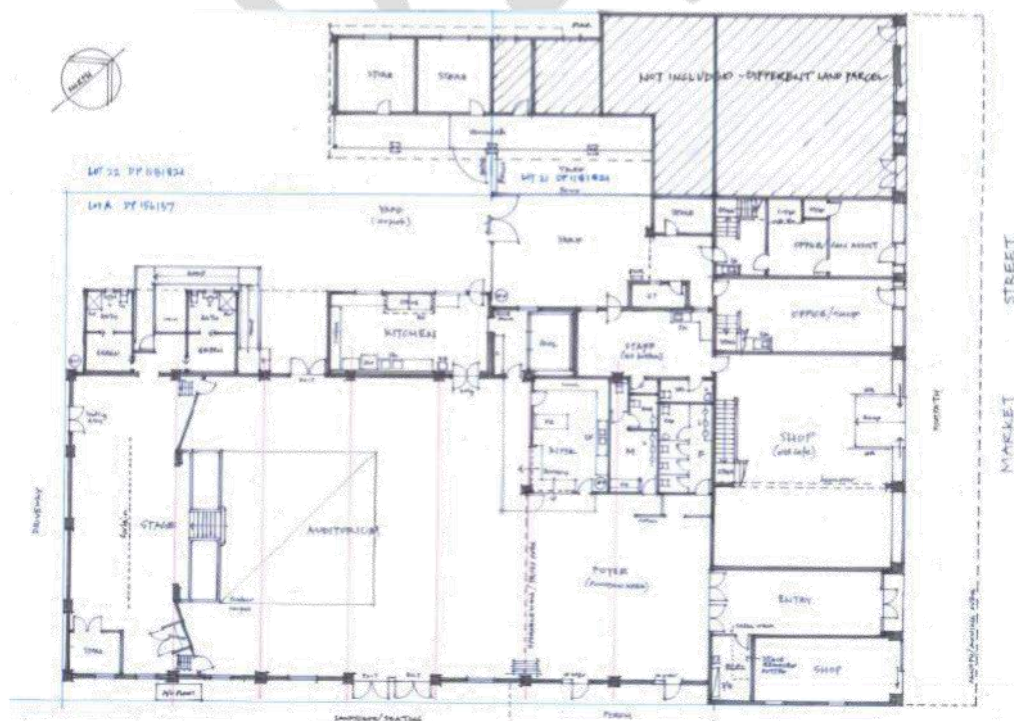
Ground Floor Plan for the Theatre Royal building – Noel Thomson Architecture
